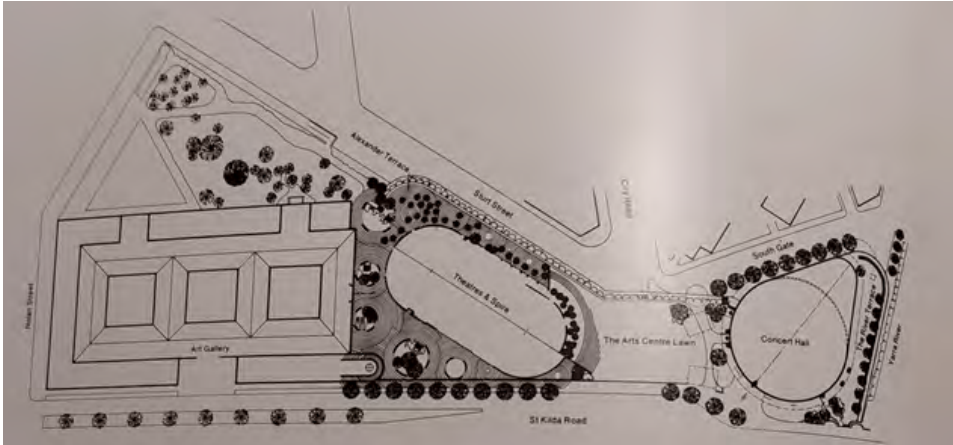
Plans for the Theatres Building (undated) (*A Place Across the River*, p136).
